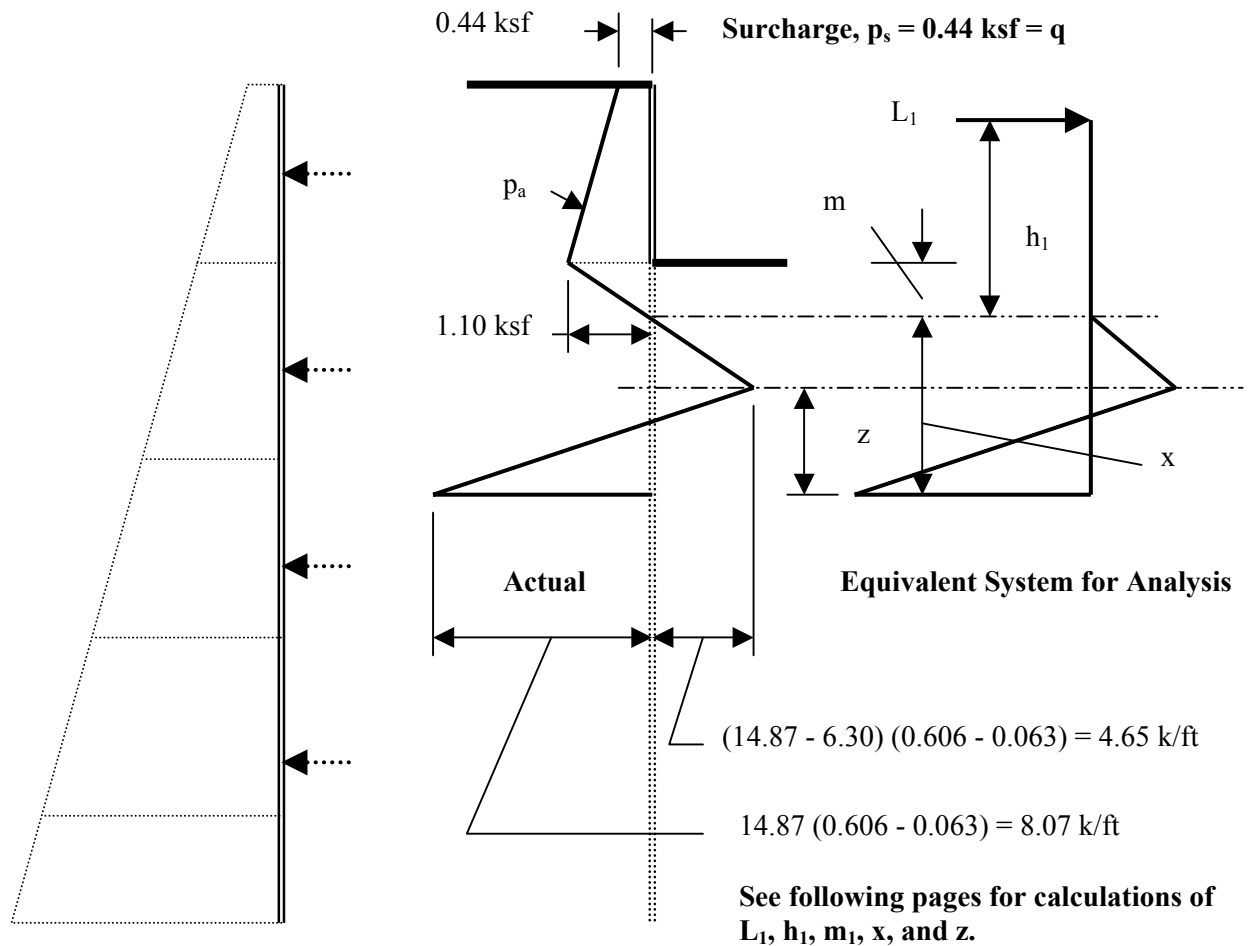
Step 4—excavate to el 78.5, first-stage excavation
